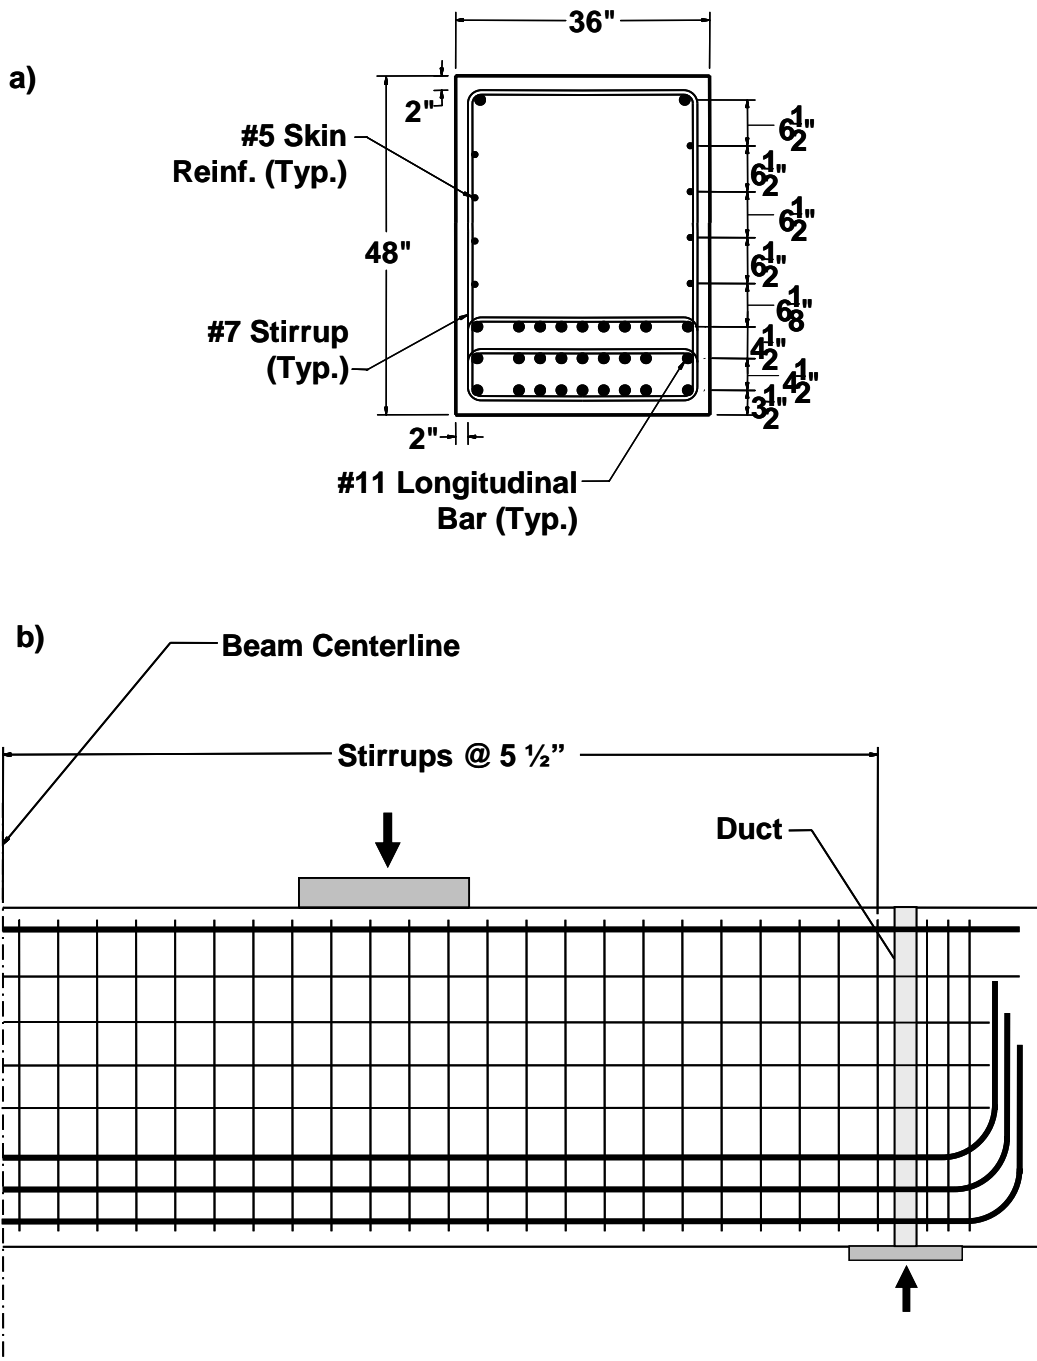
Shear span 2B a) Cross-section; b) Elevation
